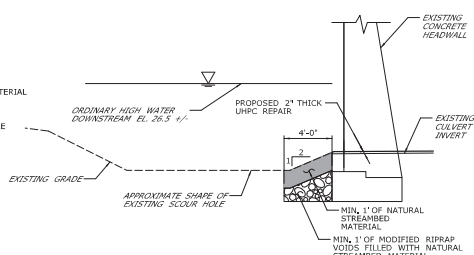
DETAIL A - INLET SECTION (LOOKING WEST)
